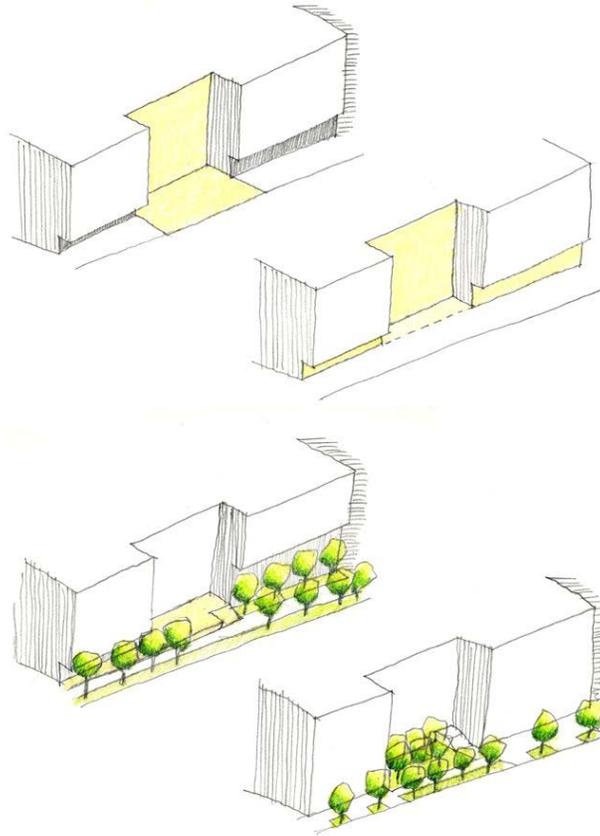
Concept sketches of sidewalk treatment on Aurora Ave N.
